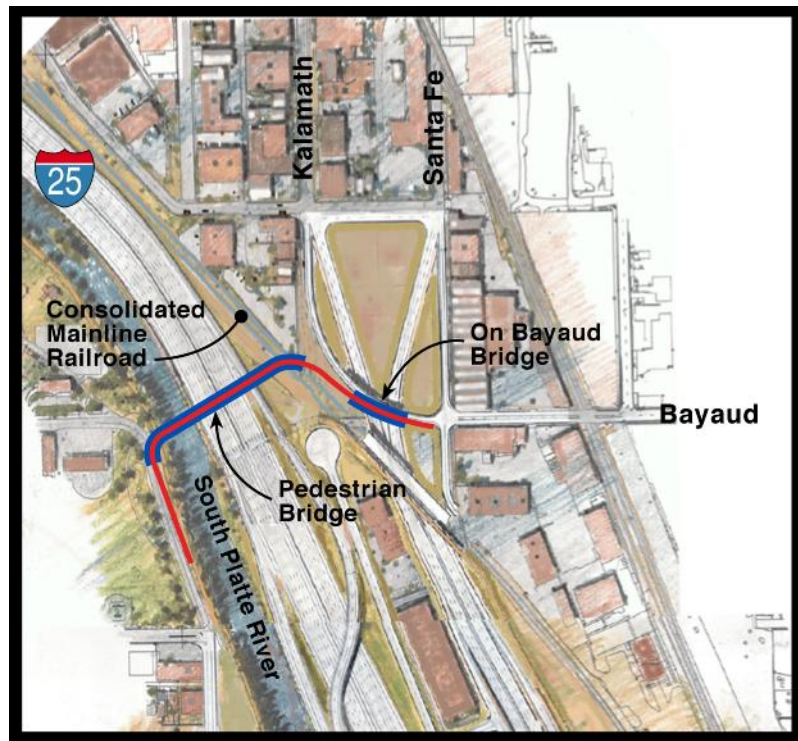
System Alternative 3, Bayaud Avenue Bike / Pedestrian Structure
